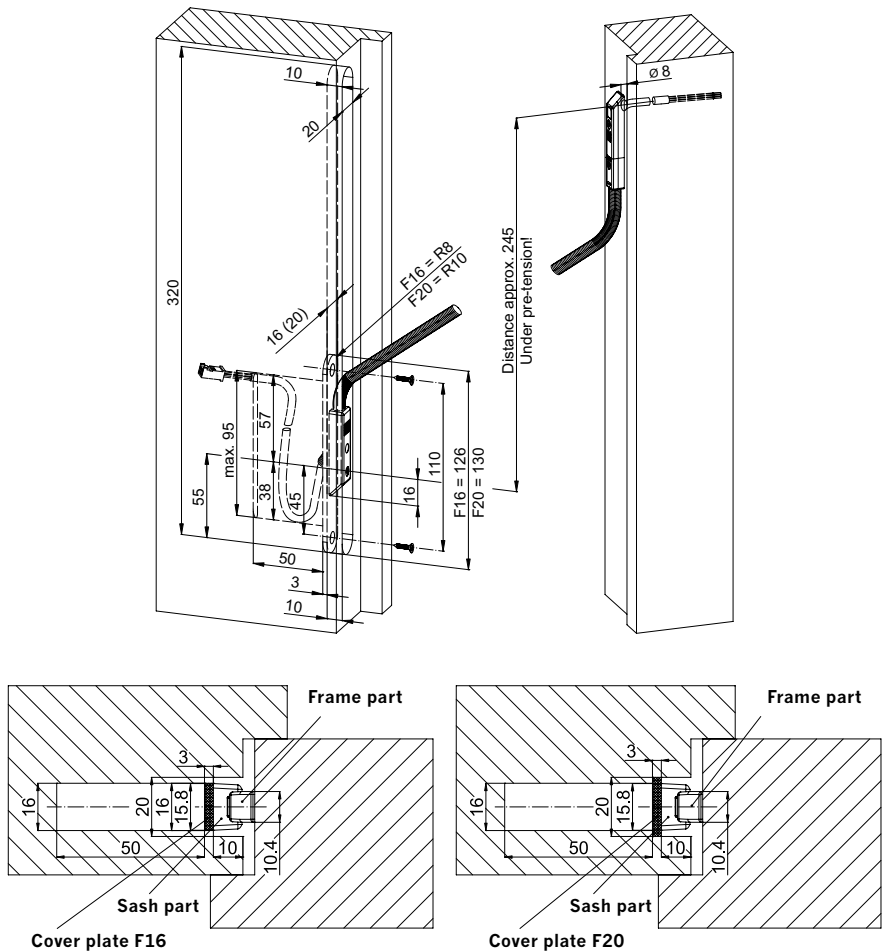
Routing dimensions for KÜ-T1-STV and cover plate F16 or F20 (dimensions in mm)
